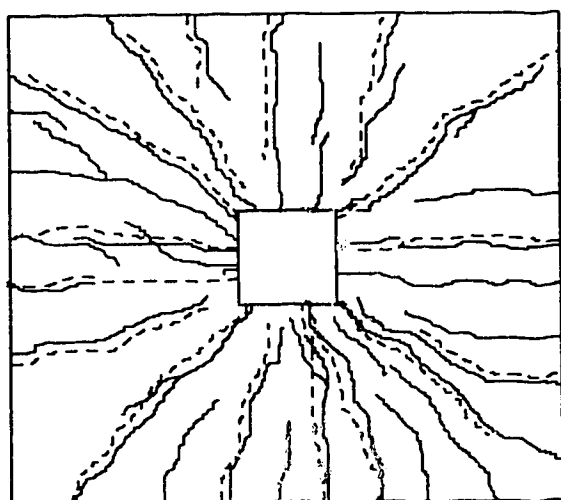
Deep beam behaviour of interior sandwich plate specimen with unloaded slab
